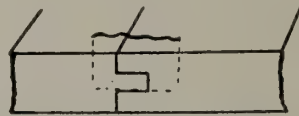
Match tongue and groove re-inforced with corrugated steel fasteners.
